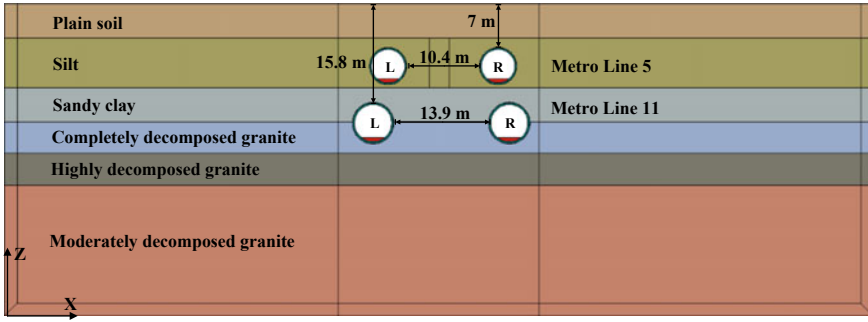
The transverse section of overlapped metro tunnels together with the soil layers
